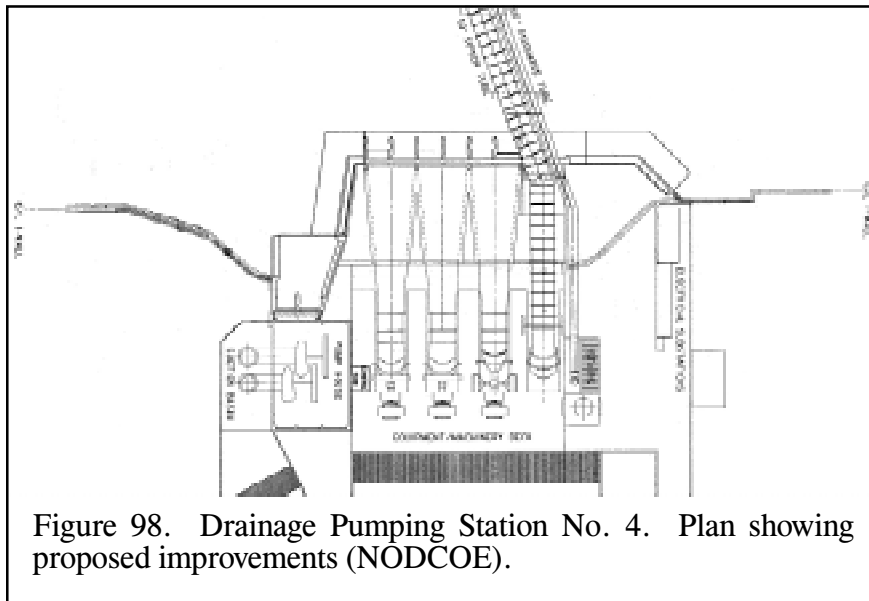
Drainage Pumping Station No. 4. Plan showing proposed improvements (NODCOE).
